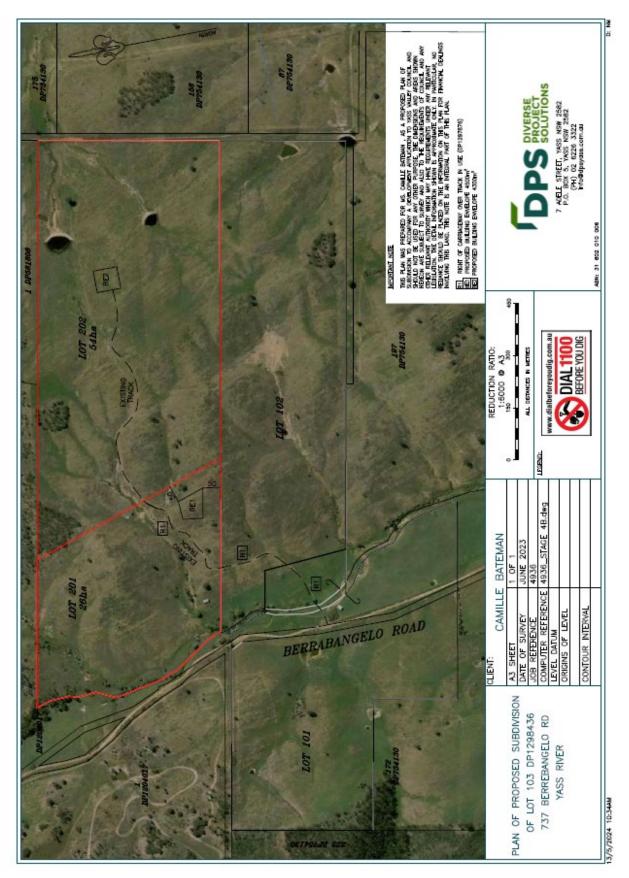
Proposed Plan of Subdivision (Source: DPS YASS P/L, May 2024)
